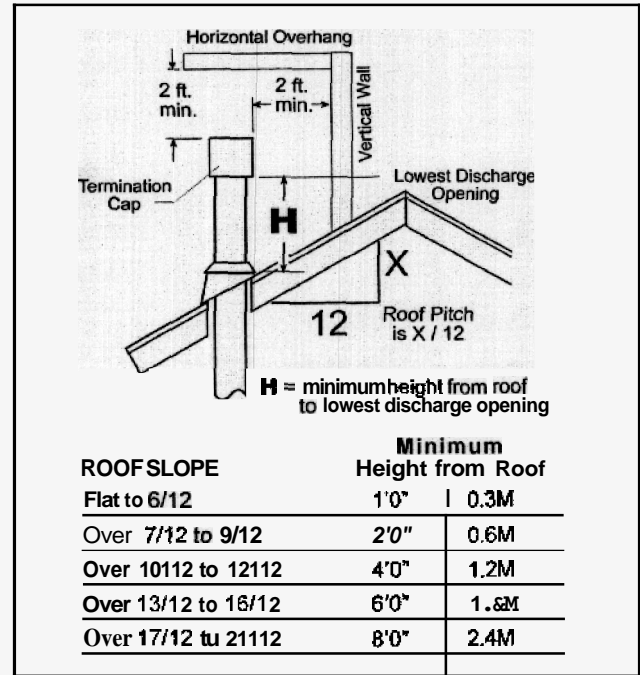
Gas Vent Height Rule: Vertical vent termination height above roof:
